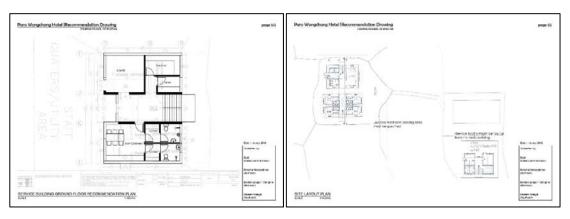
Recommendation drawings of Paro Wangchen hotel.
